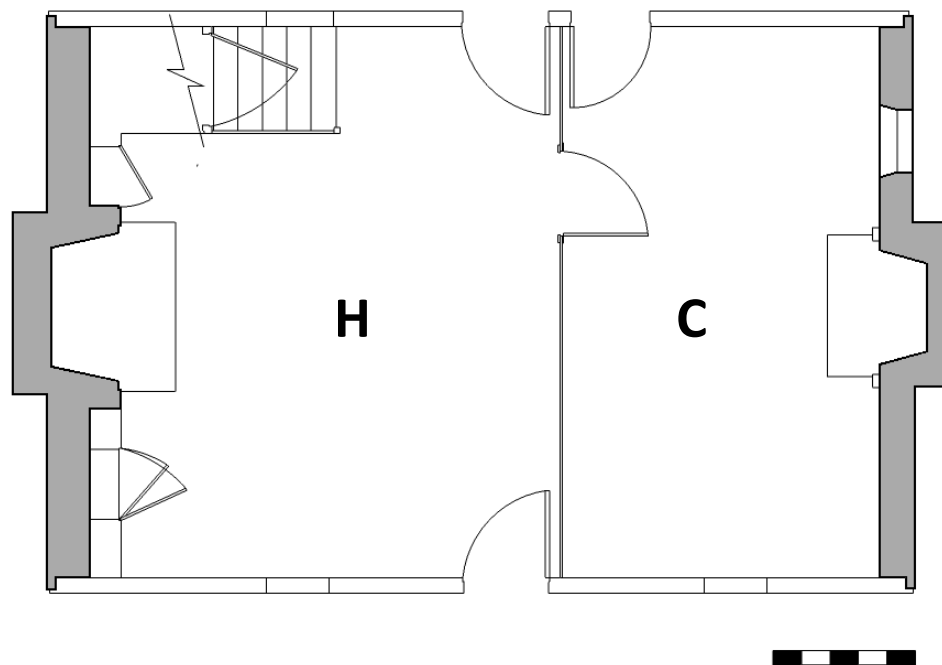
Ground-floor plan of Arbuckle Place. The two rooms are separated by an original board partition wall. Drawing by author.
